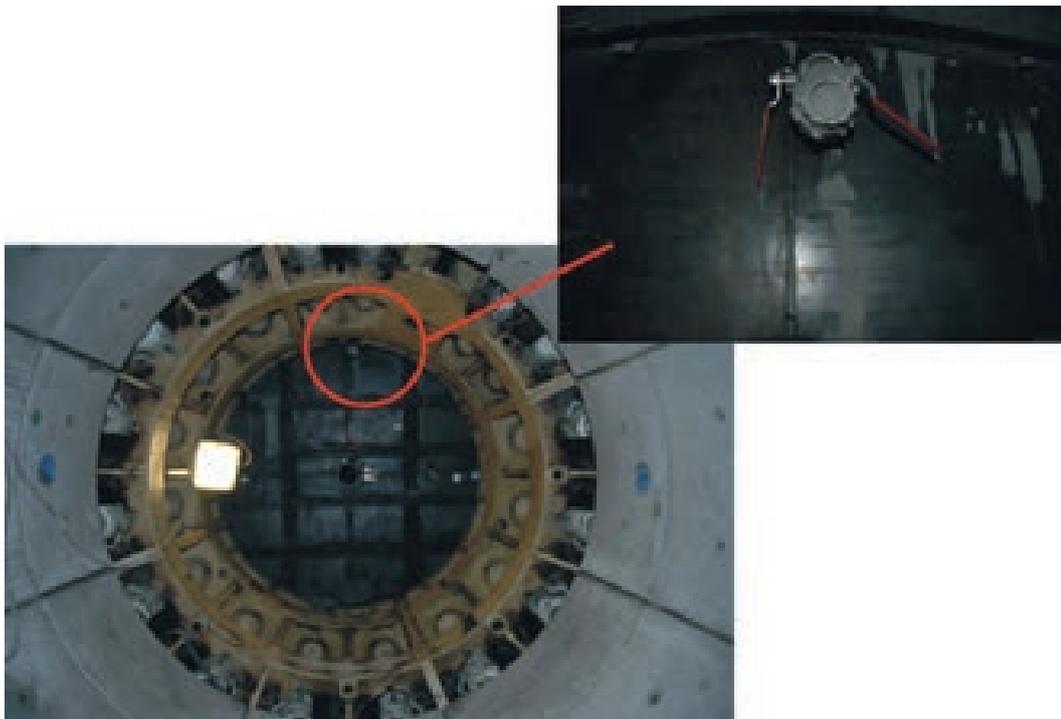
Abandoned shield and the reinforcement structure of the end plug with the tap through which the space behind the structure is filled with concrete.
